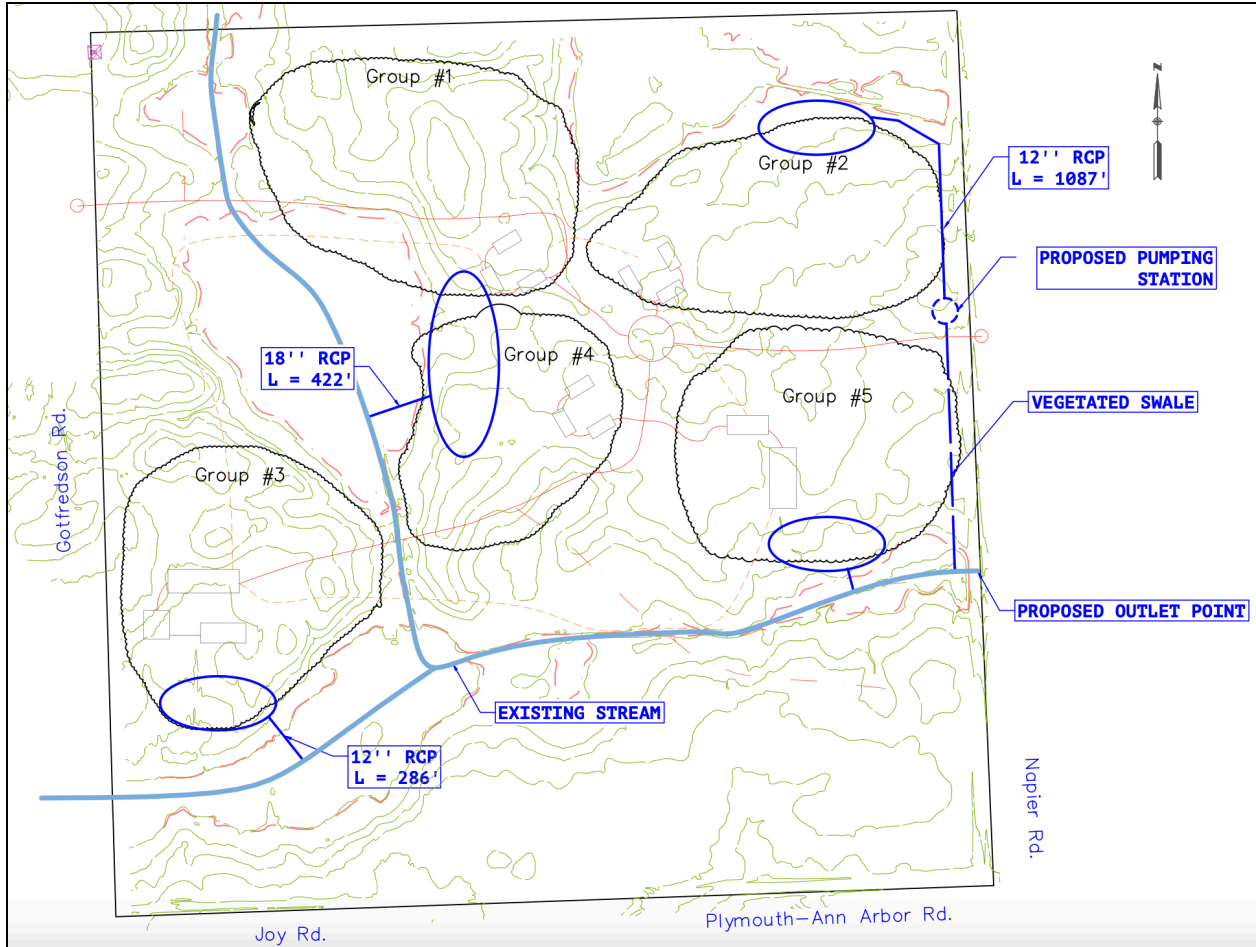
Conveyance transports stormwater runoff from building sites to outlet
